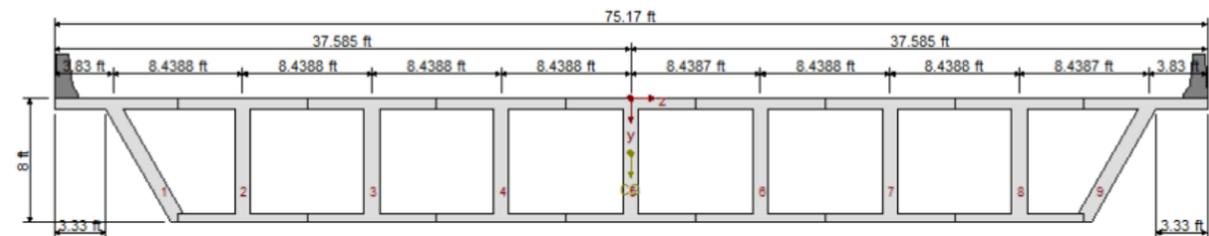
Bridges on SR30 over SR 303 - Typical Section
